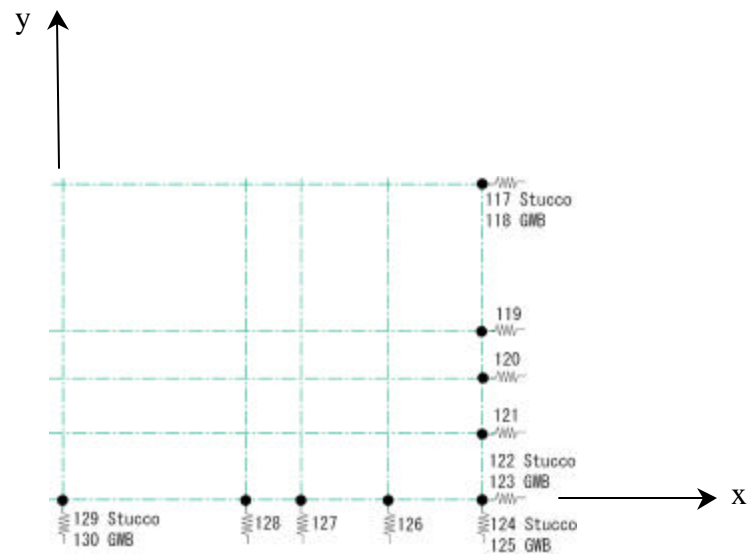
Locations, Orientation and Numbering of Shear Elements for Interior and Exterior Vertical Walls of the Small-House Index Building.
